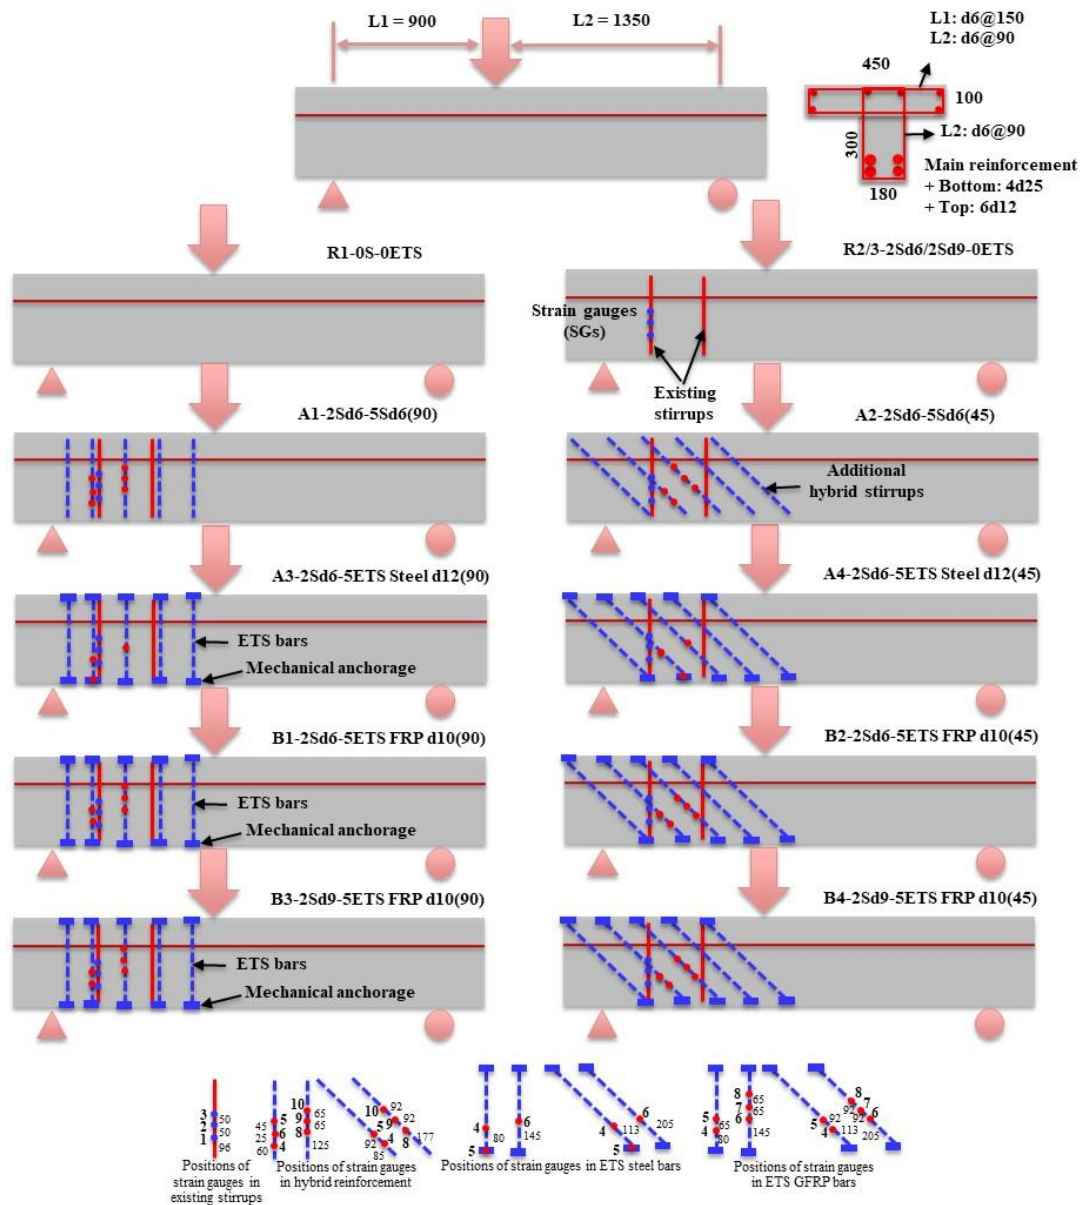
Configuration of the tested beams (dimensions in mm)
